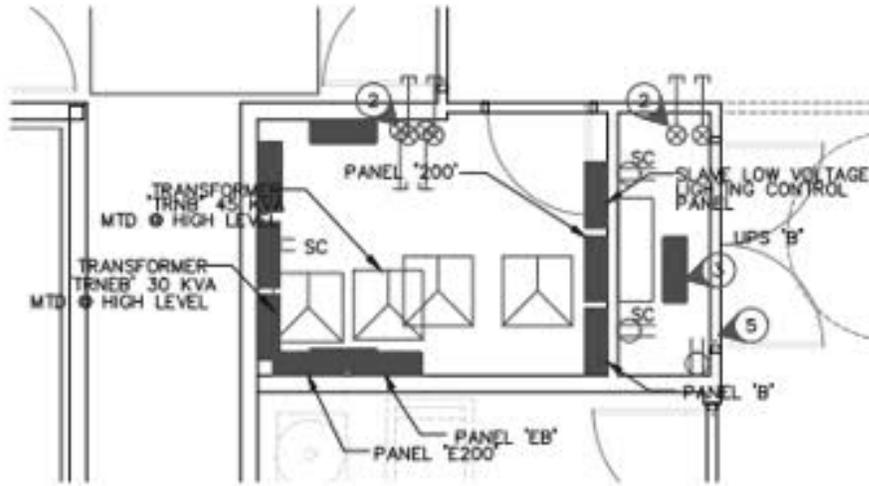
Plan View Layout – Main Floor – Electrical Room #2
